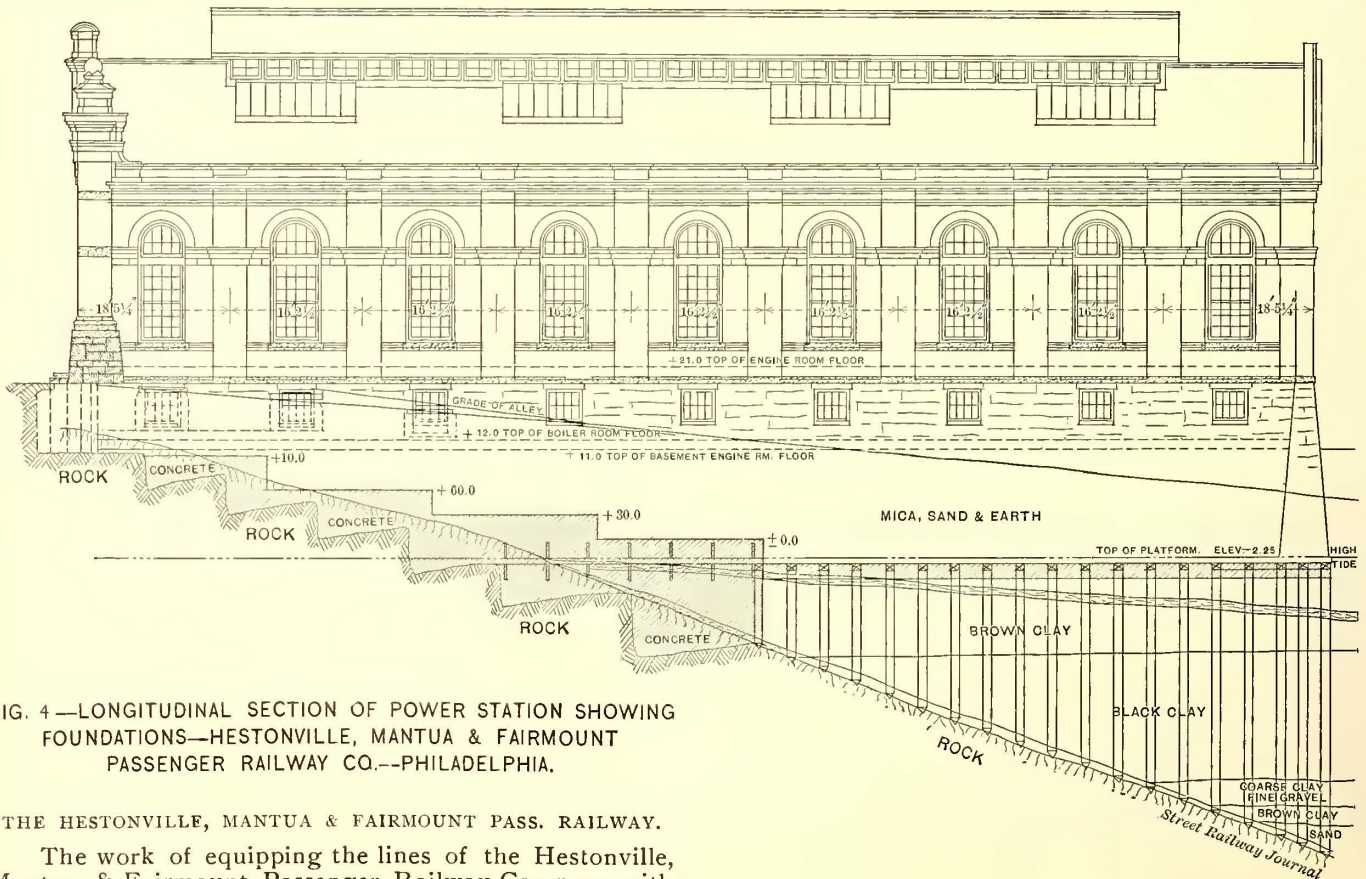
LONGITUDINAL SECTION OF POWER STATION SHOWING FOUNDATIONS—HESTONVILLE, MANTUA & FAIRMOUNT PASSENGER RAILWAY CO.—PHILADELPHIA.
